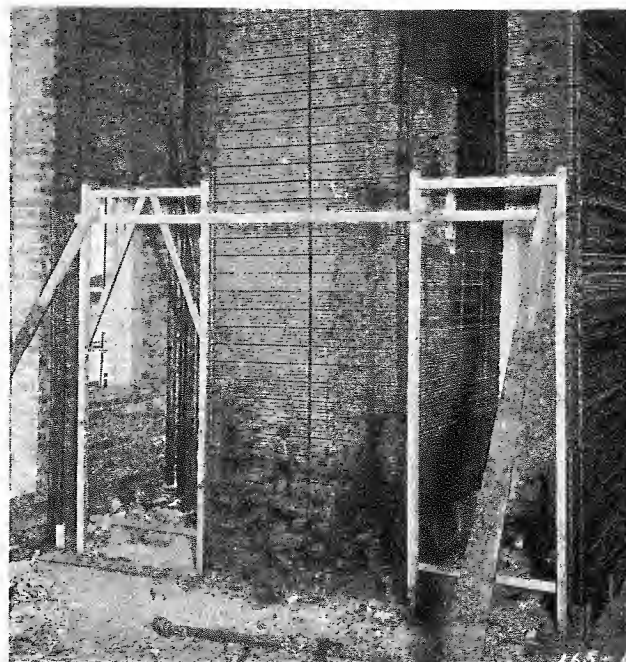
Cross-Bracing of Buck and Diagonal Bracing to Floor.
